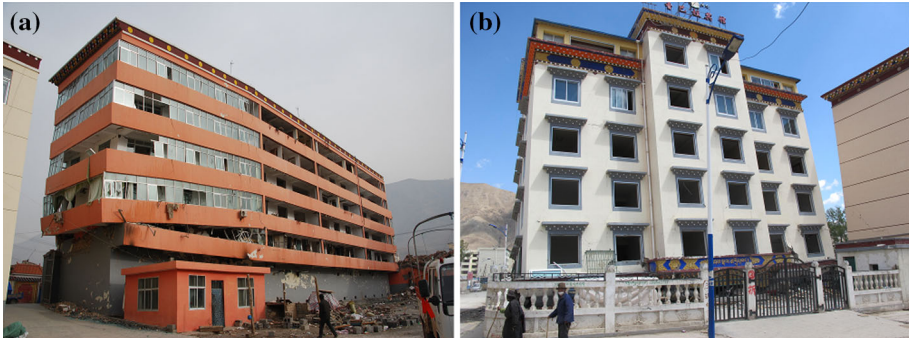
Collapsed second floor that was used as a large restaurant in the Gesaer Hotel building (Part I)
